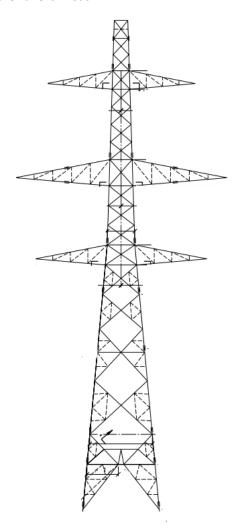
Typical Steel Lattice Standard SSE400(c) Suspension Tower Design
